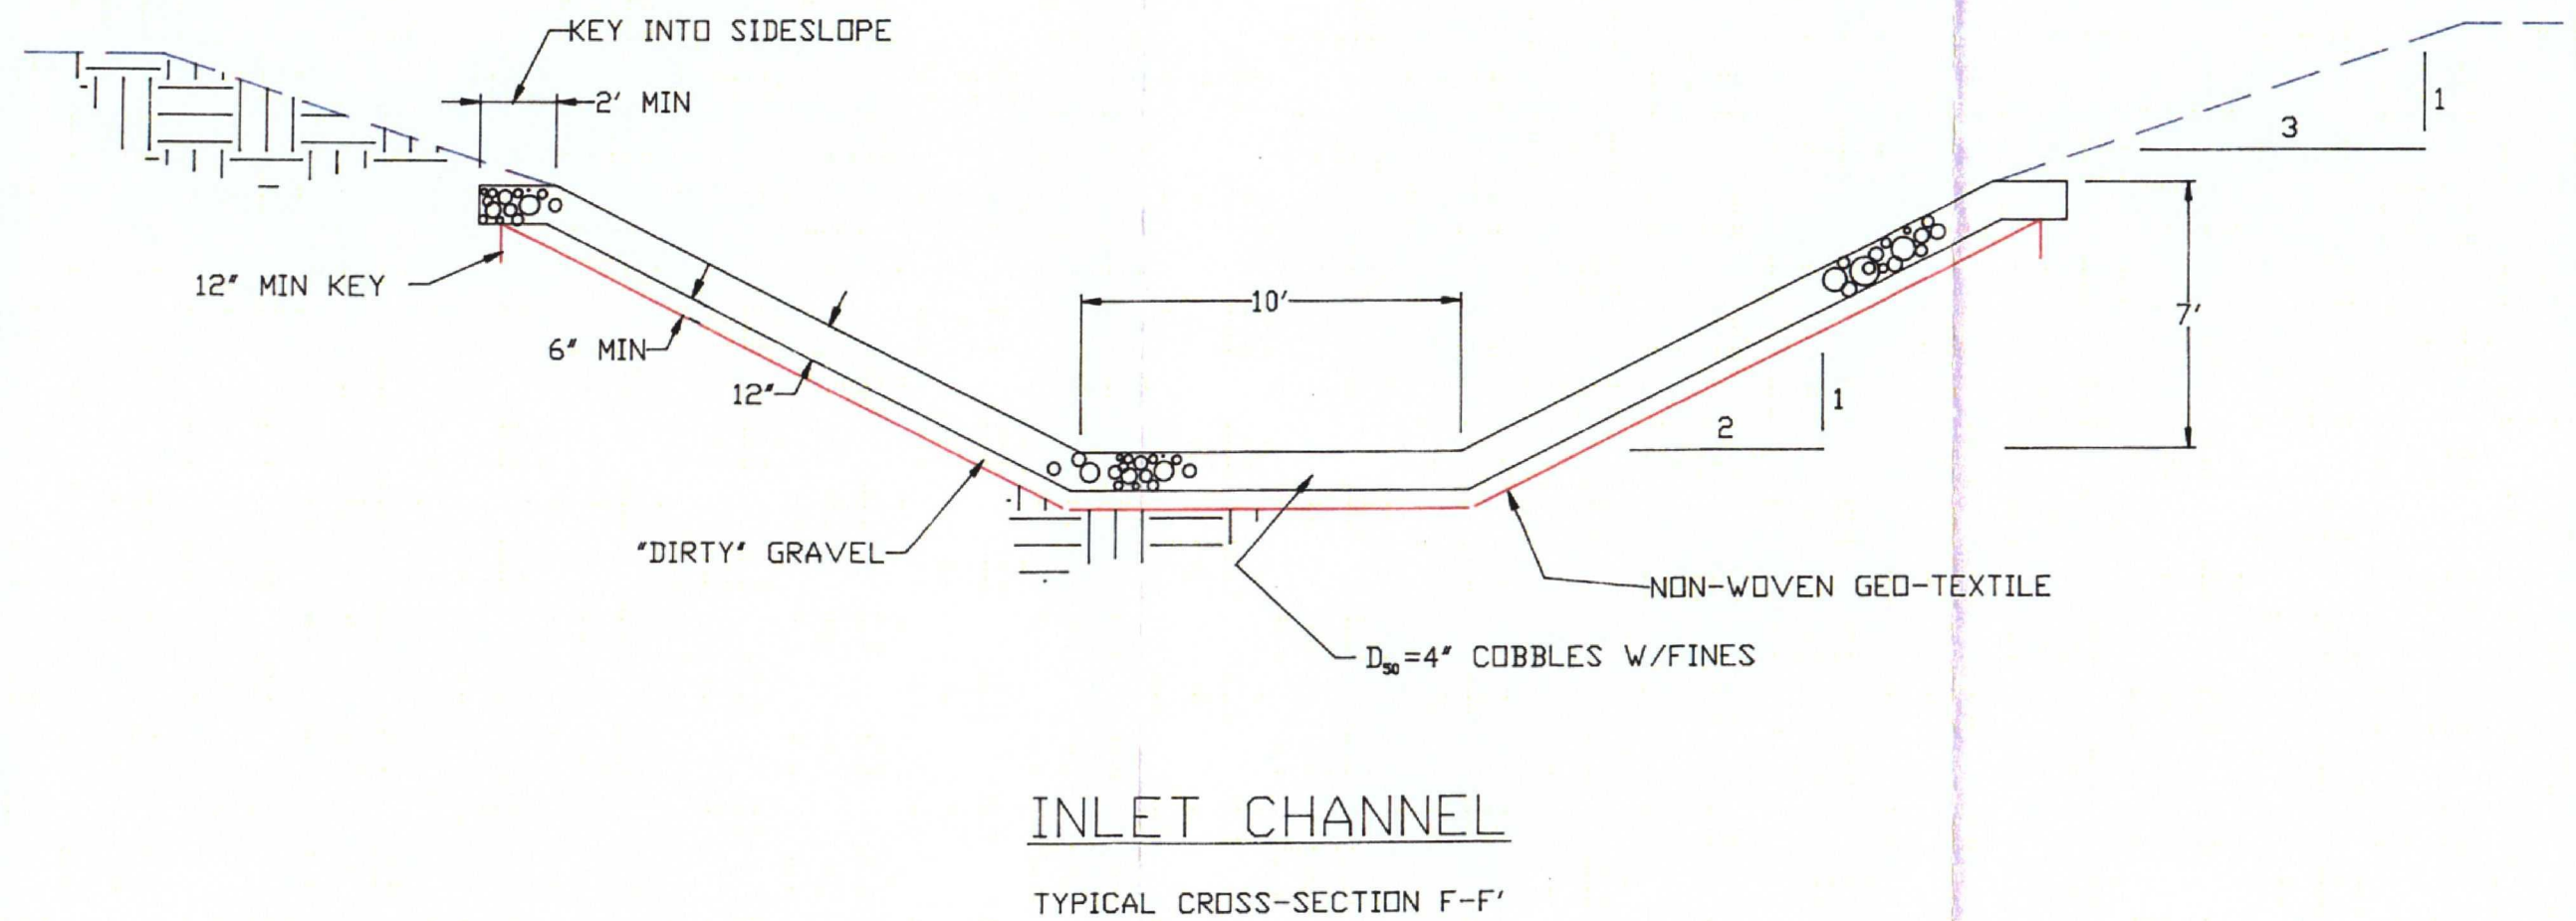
Typical cross-section of the inflow channel for the proposed flood routing system.
